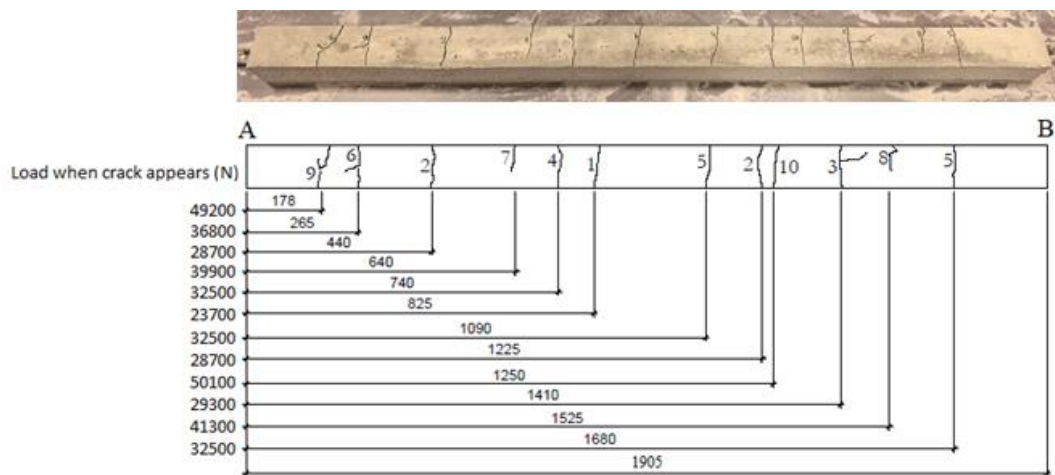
Prism test and crack pattern: #4 steel – specimen 2.
